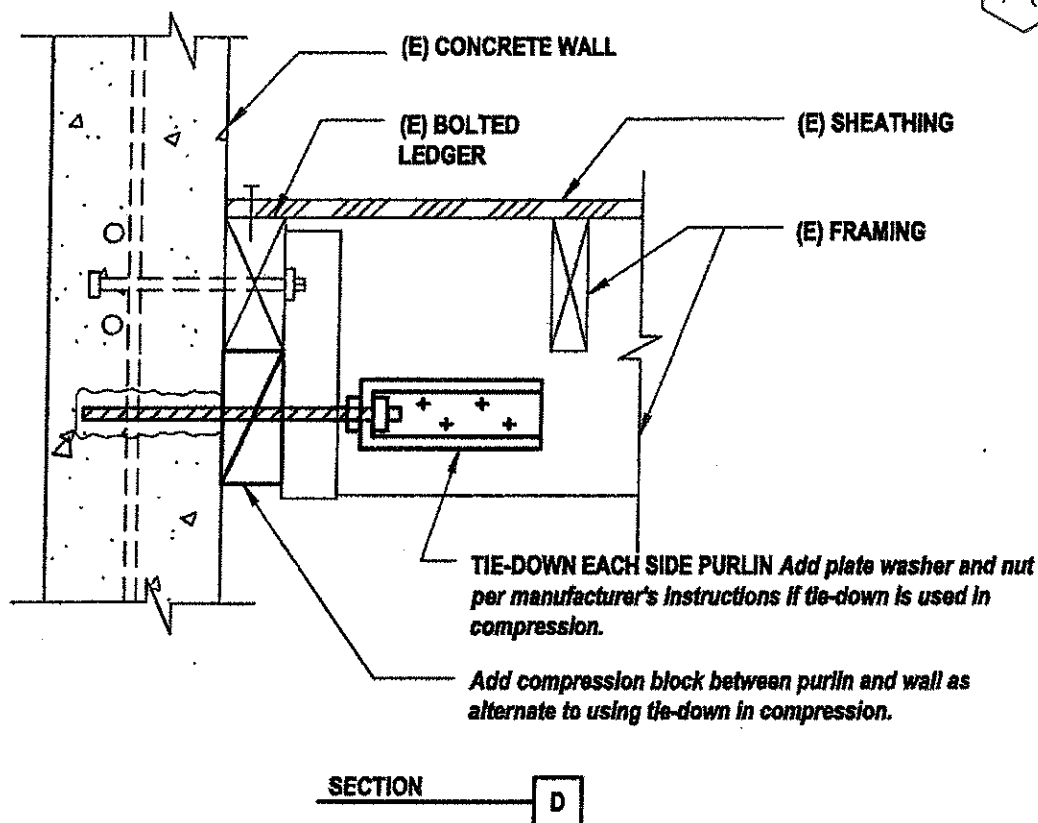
C: Wall Out-of-Plane Anchorage for Flexible Wood Diaphragm at Subpurlins – Roofing Removed
